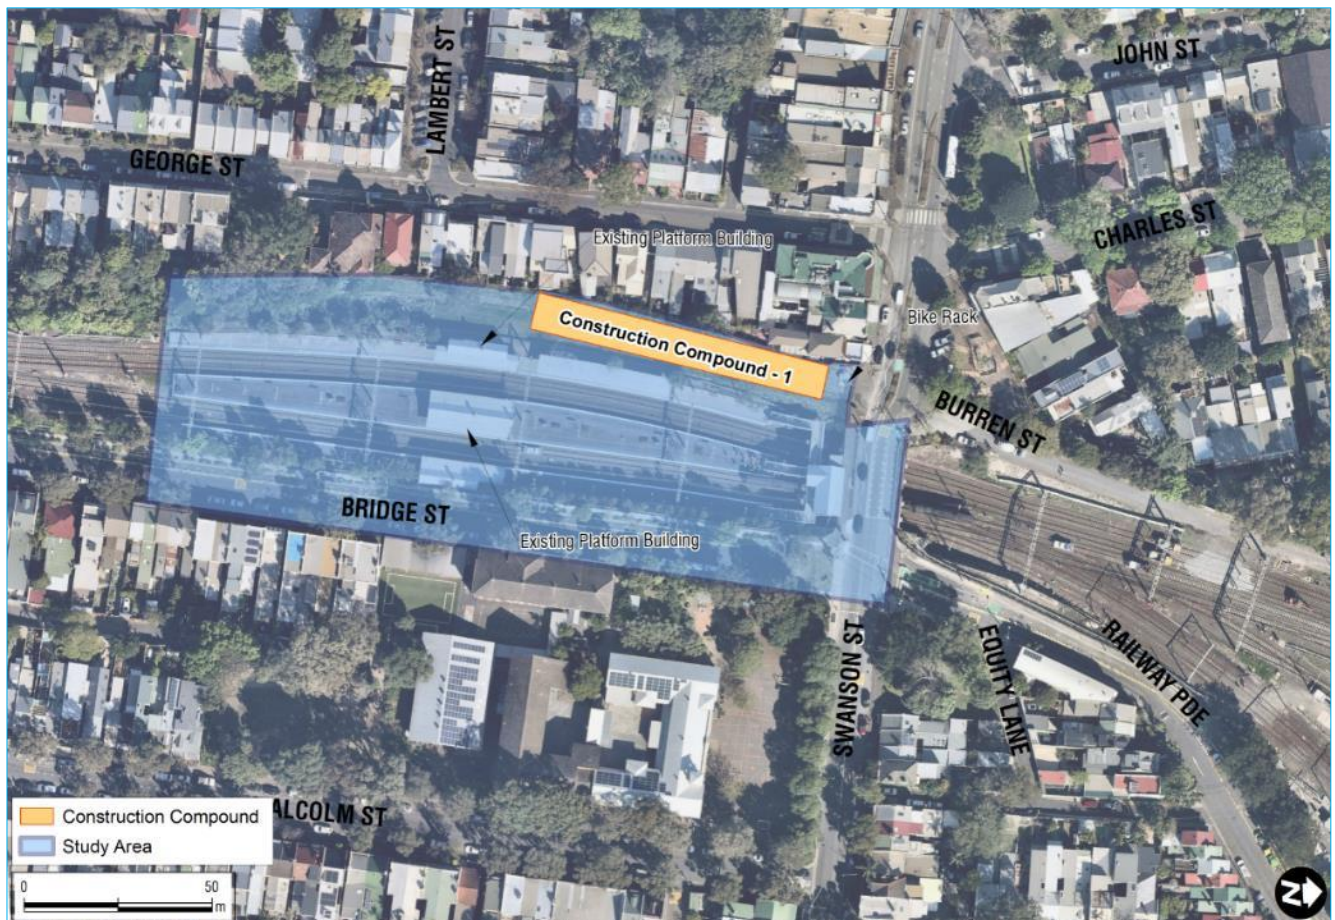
Construction compound 1 within Railway Reserve off Swanson Street
